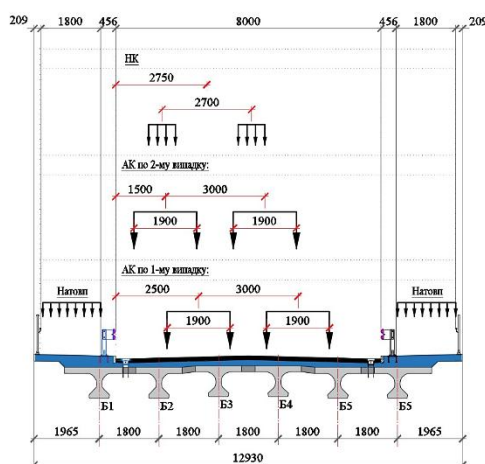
Layout of temporary vehicular loads and pedestrian crowd loads on the sidewalks across the bridge (In Ukr.)
